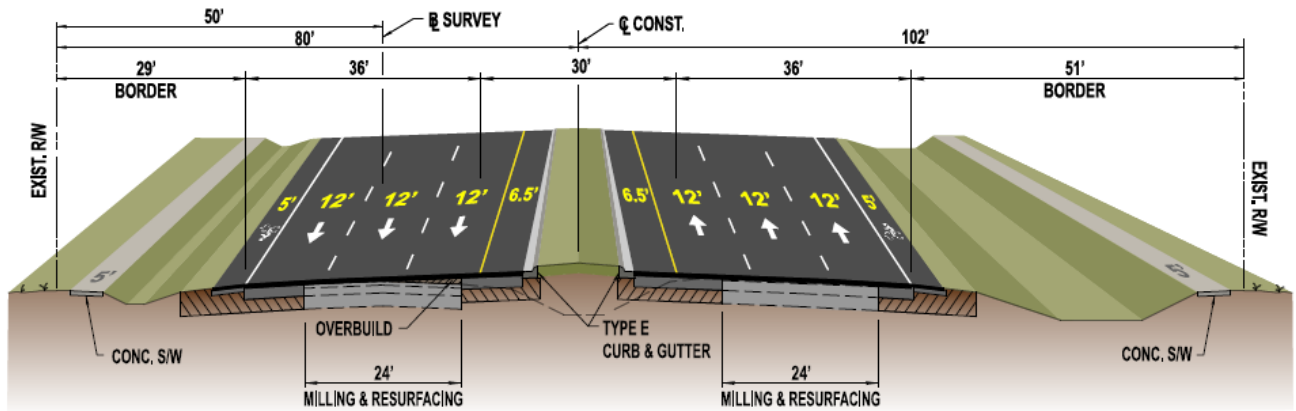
SUBURBAN NEW CONSTRUCTION TYPICAL SECTION
